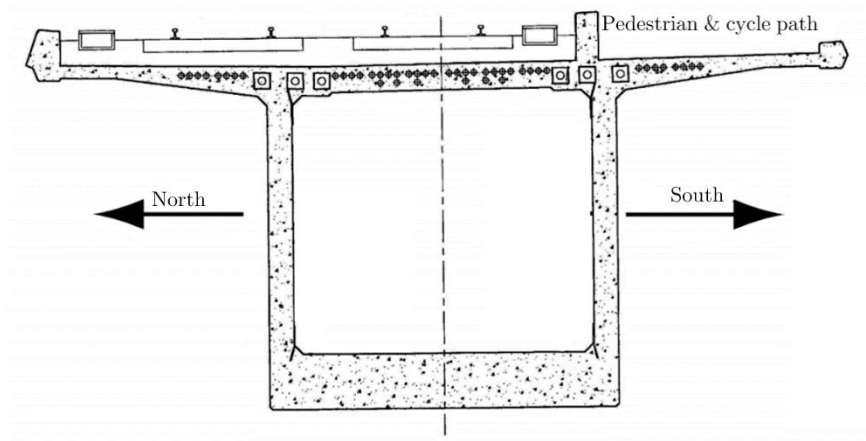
Box girder cross-section of The Alvik bridge (Appendix B.1).
